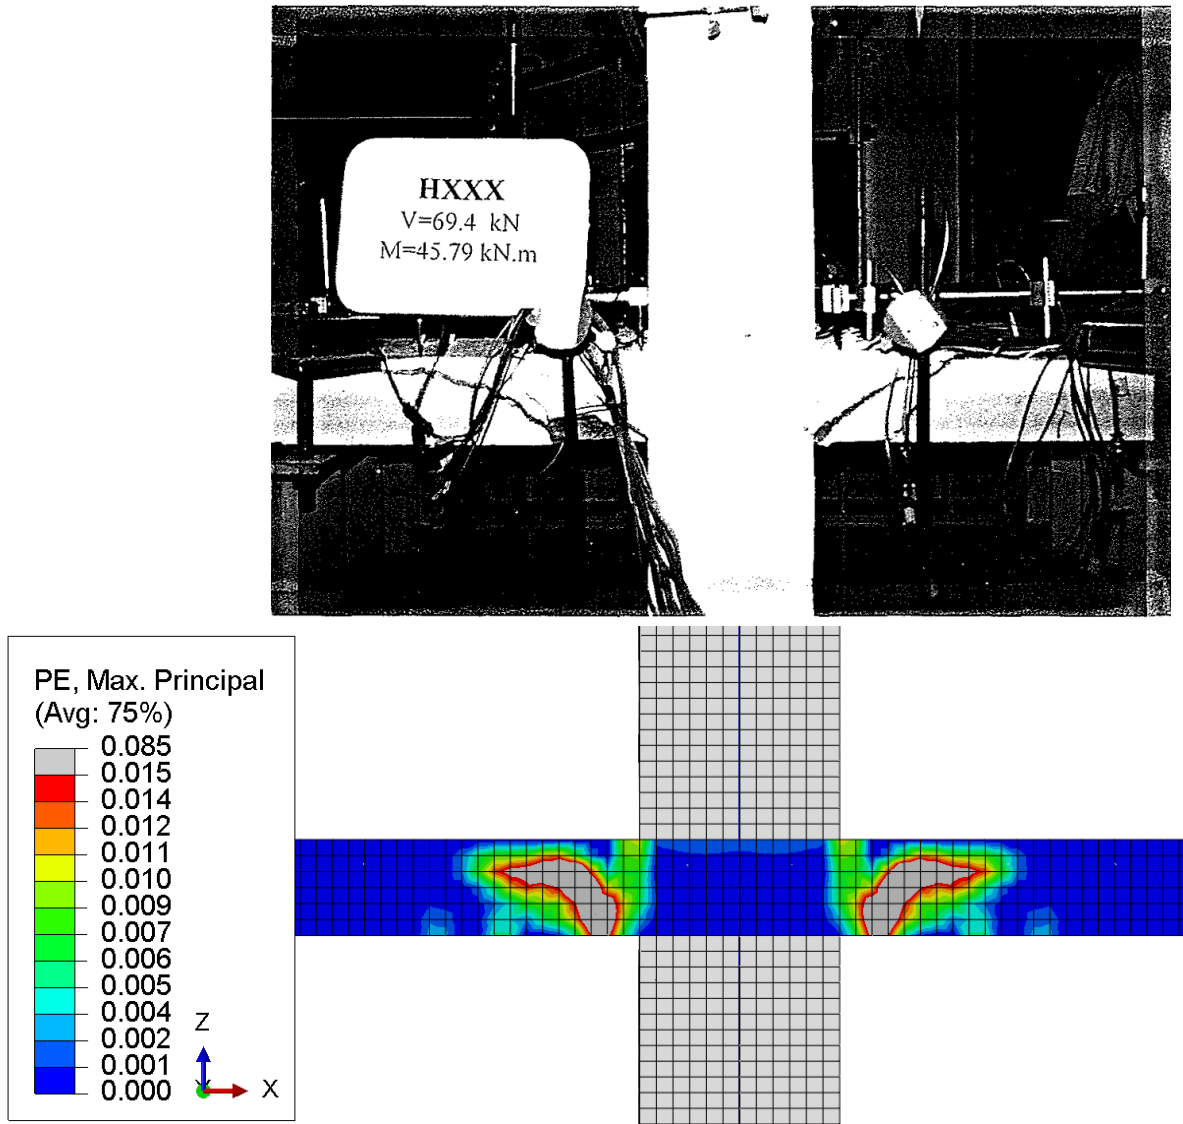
Column view of specimen HXXX experiment (El-Salakawy, 1998) and FEA crack patterns. Photograph reprinted from *Shear behaviour of reinforced concrete flat slab-column edge connections with openings* (p.146), by E. El-Salakawy, 1998. Reprinted with permission.
